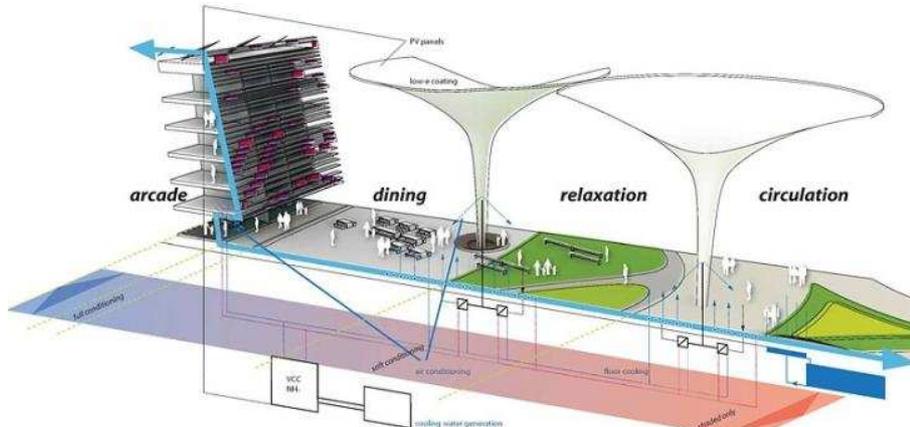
shows cross sections demonstrating water flows to underground water tanks.
